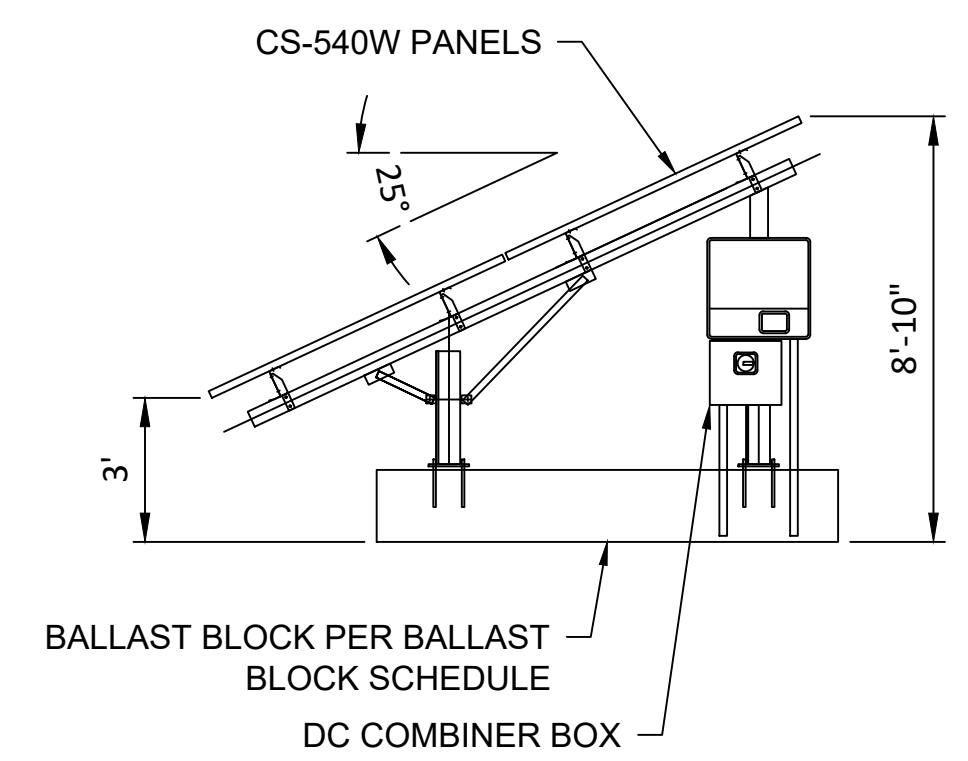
Exhibit D -SUP Application with Site Plan (Original Submission, 2022)
